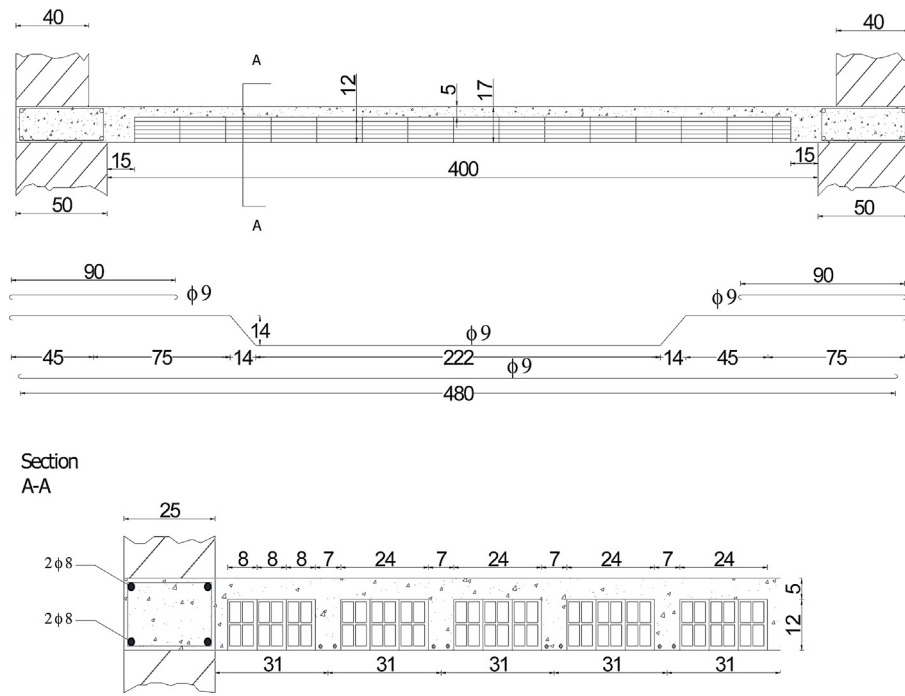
Constructive section of R.C. floor according to Santarella [1].
